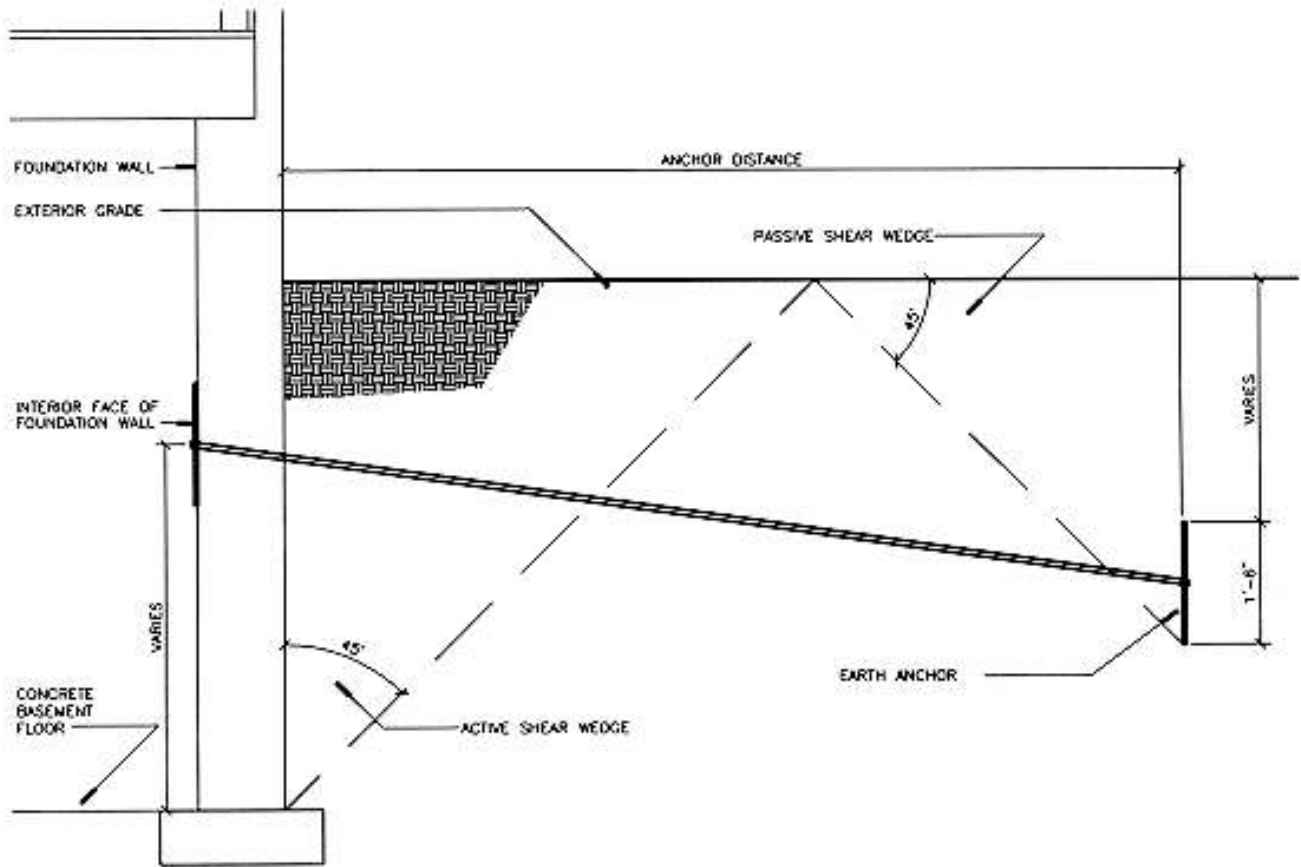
\*—TYPICAL WALL ANCHOR INSTALLATION
